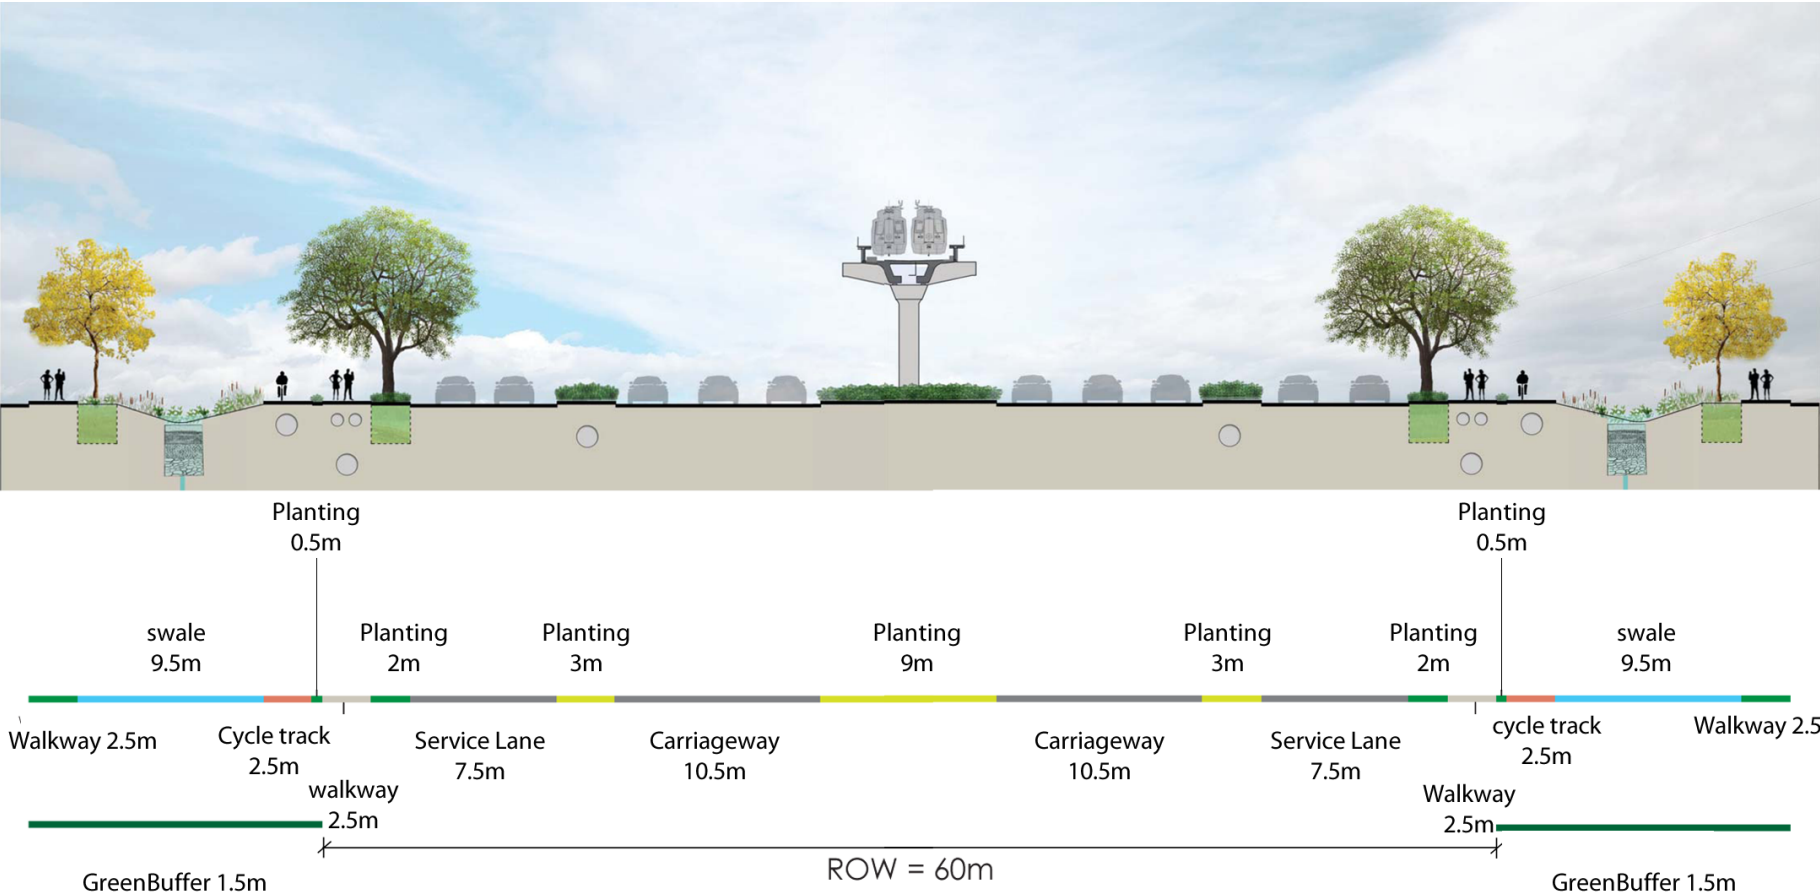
Proposed Typical Section 60 mts. ROW HR-2 (New Chandigarh Boulevard)
